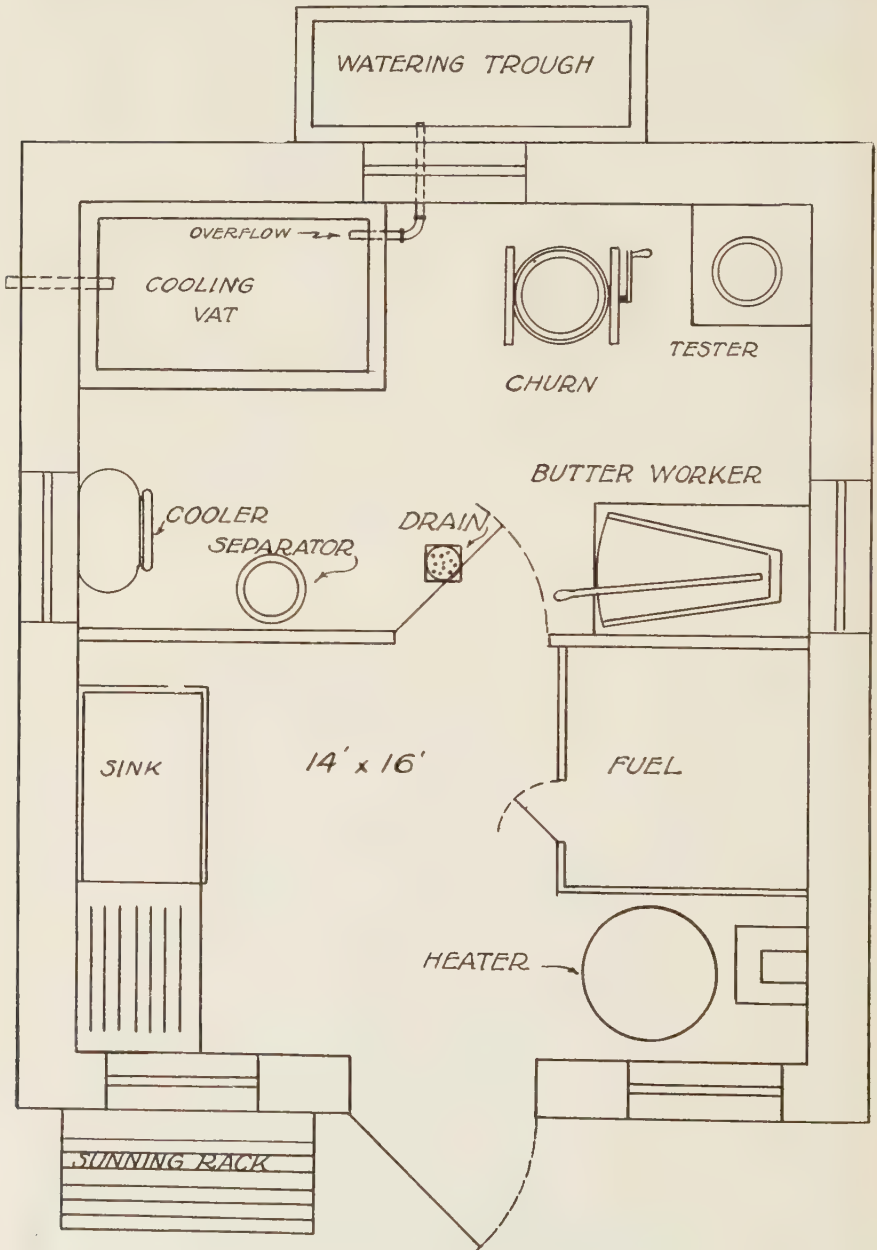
Plan for a 14 by 16-foot milk house with the heater and wash room separated from the cooling room.
